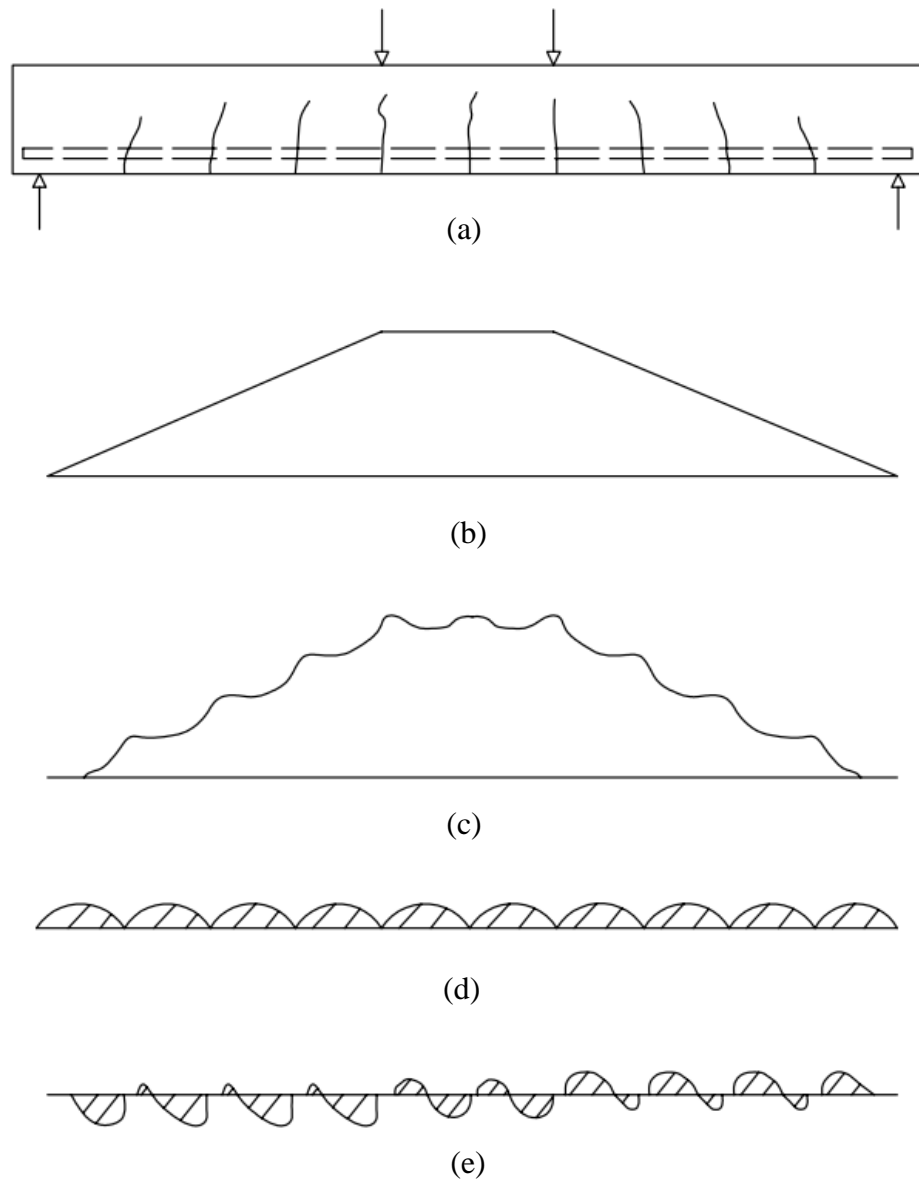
Variation of Tensile Concrete Stress, Steel Stress, and Bond Stress Along a Cracked Concrete Beam (after MacGregor and Bartlett 2000): (a) Reinforced Concrete Beam, (b) Bending Moment Diagram, (c) Variation in Steel Stress, (d) Tensile Stress in Concrete, and (e) Bond Stresses
